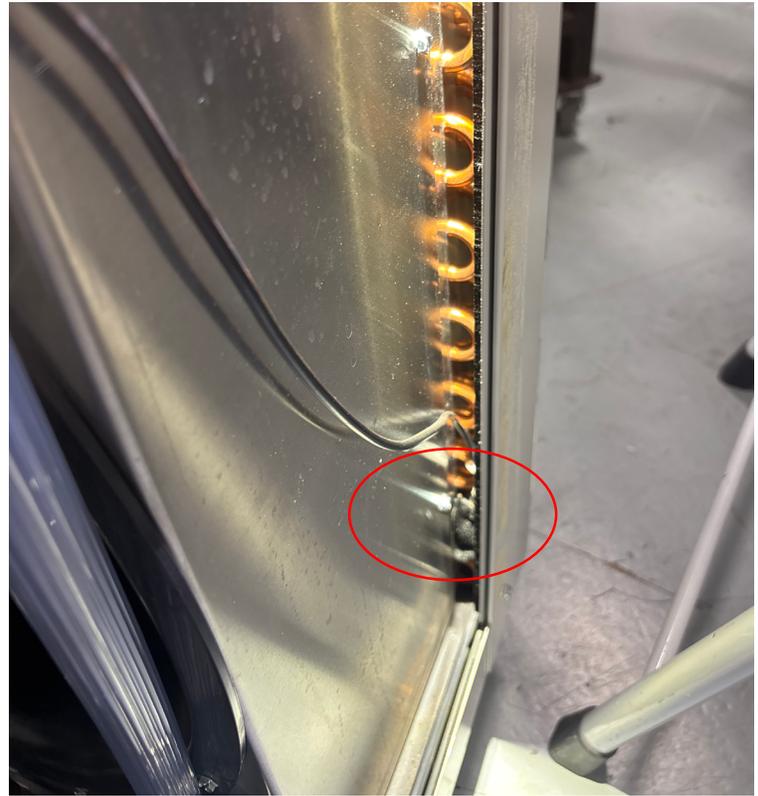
(Outdoor Coil Temp. Sensor, T1) Outdoor Coil Sensor is attached to the Condenser coil on the right hand side.
